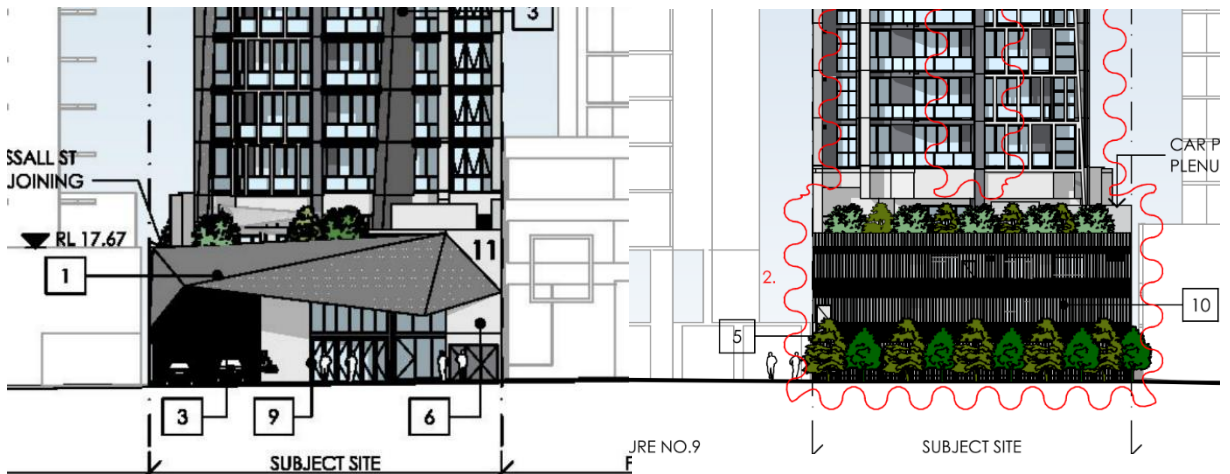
Approved (left) and proposed (right) entrance awning along Parkes Street (southern elevation).
